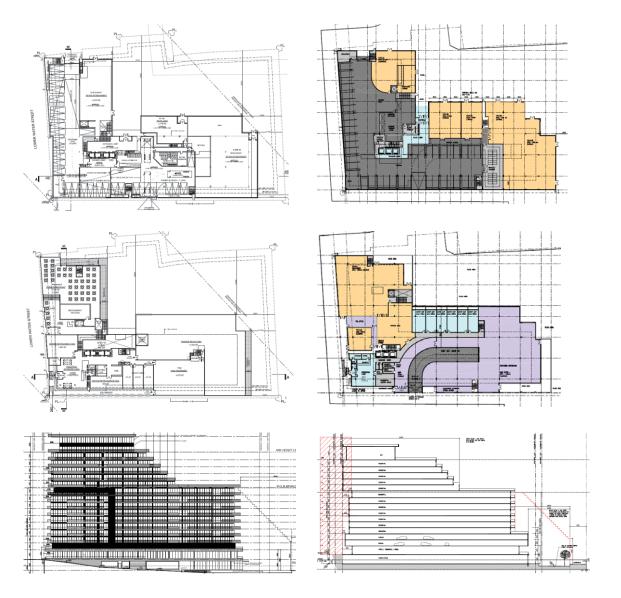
Floor plans at Levels 1 and 2 and south elevation for the 2015 wind tunnel testing
